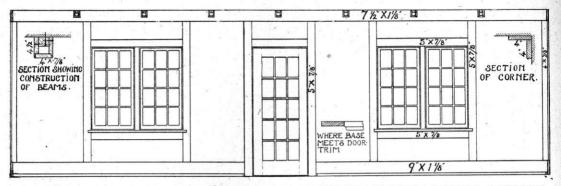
AN ELEVATION OF THE INSIDE WALL OF A CRAFTSMAN ROOM, SHOWING A PRACTICAL, ECONOMICAL AND DECORATIVE FORM OF CONSTRUCTION: THE WALL IS PLASTERED AND A PANEL EFFECT IS GIVEN BY THE ARRANGEMENT OF DOOR, WINDOWS AND WOODWORK.
